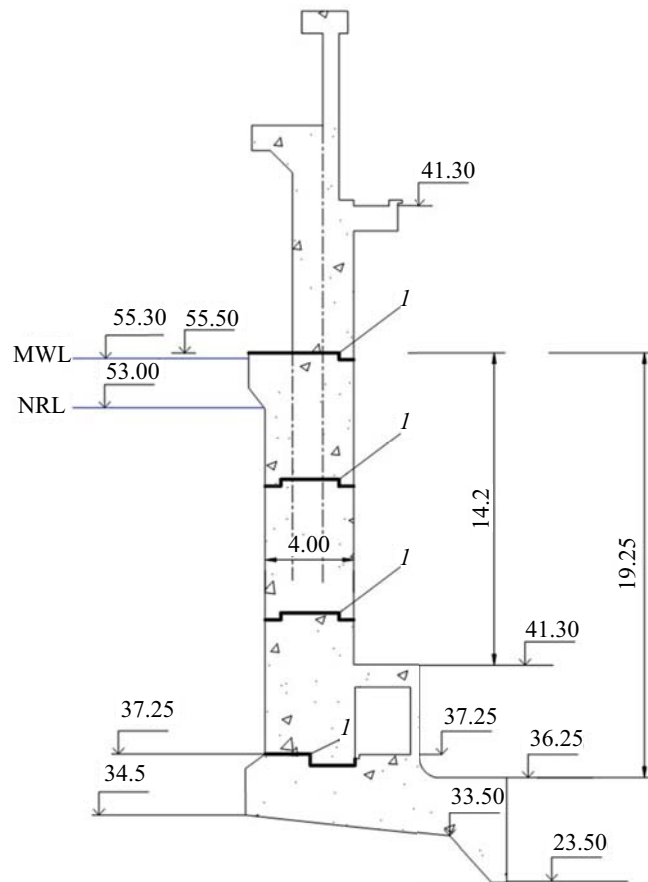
Construction joints between the concrete pouring sections of the machine hall headwall (dimensions in m): *I* — intersection construction joints
